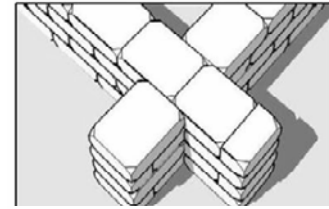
Corner reinforcement (Geiger, O. (2015, September))
